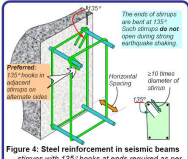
Steel reinforcement in seismic beams - stirrups with 125° hooks at ends required as per
